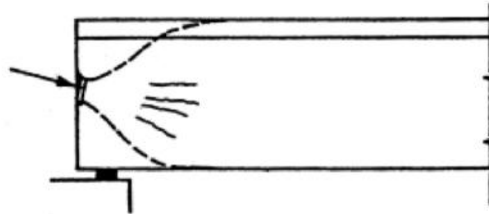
Elevation Sketch of Cracks in the Anchorage Zone
